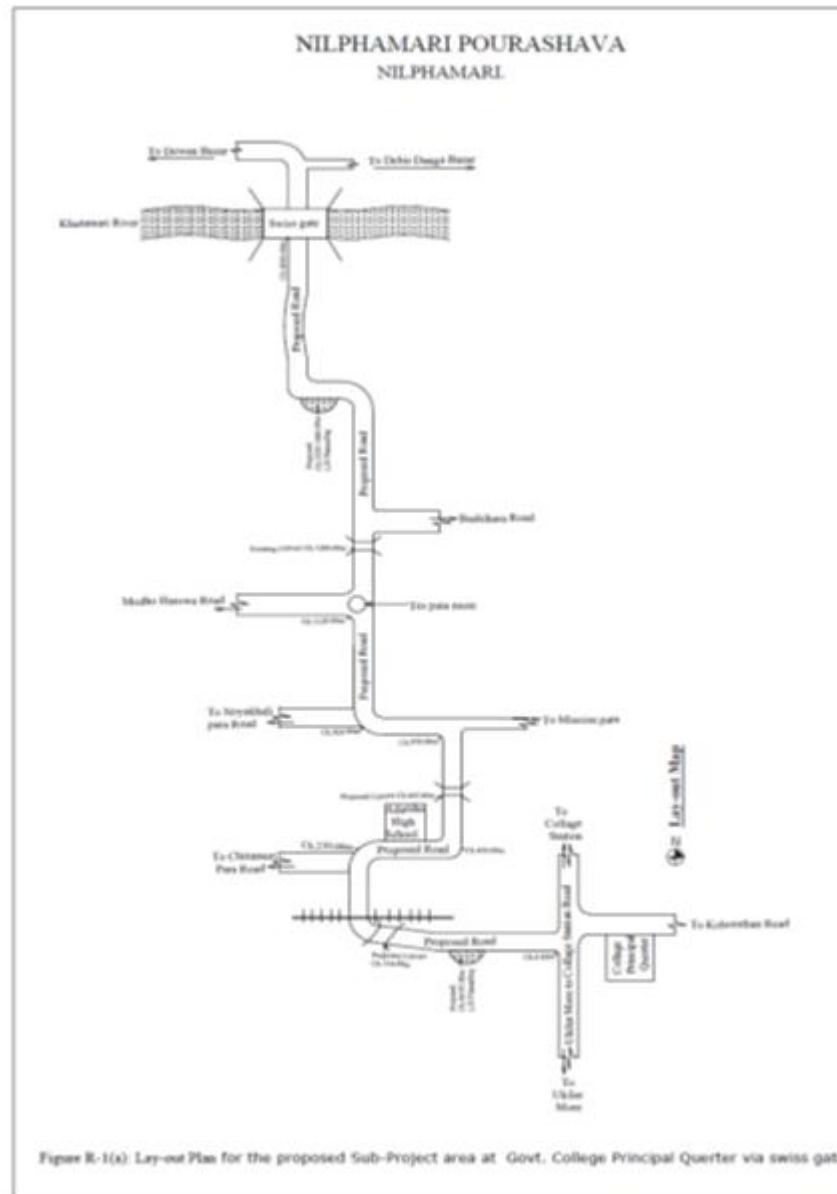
Layout Plan for the Proposed Subproject Area from Govt. College Principal House via Suitchgate
